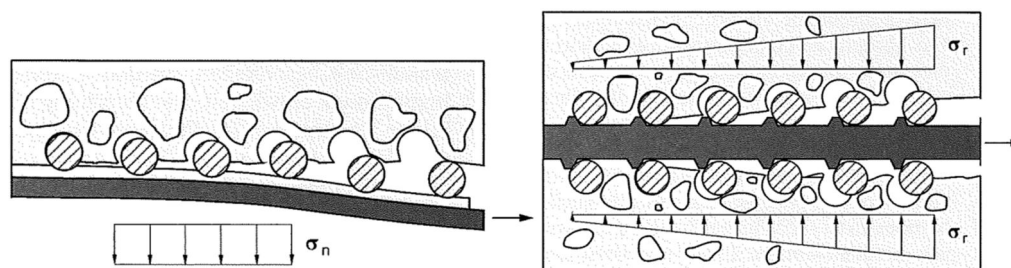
Comparison of an externally-bonded reinforcement and an ordinary reinforcing bar in concrete [83]
